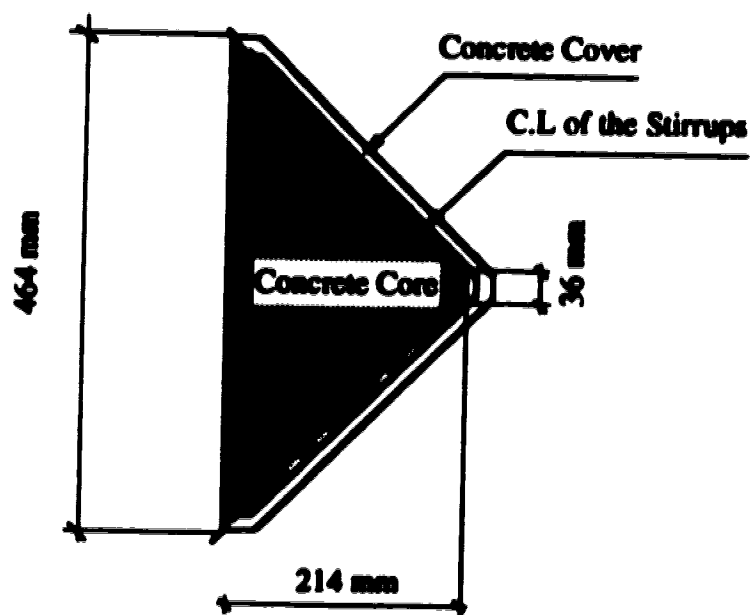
Boundaries between Concrete Cover and Concrete Core for the Triangular Specimens
